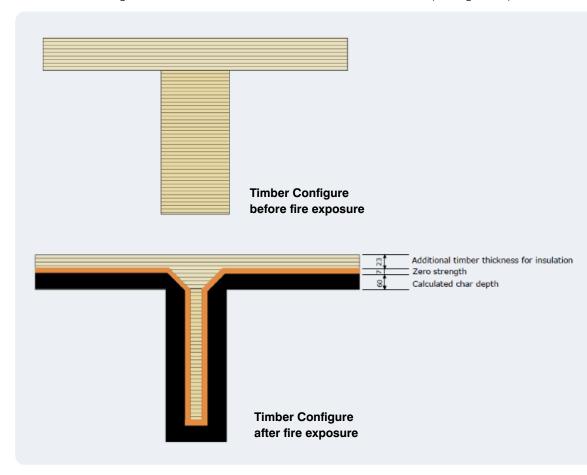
Insulation provided by the minimum thickness of the floor panel.
